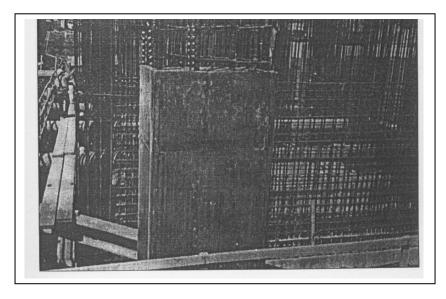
High strength silica fume concrete column in high rise structure.
